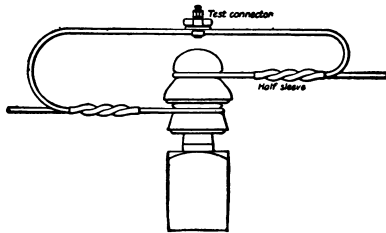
AERIAL LINE CONSTRUCTION, TEST STATION.
